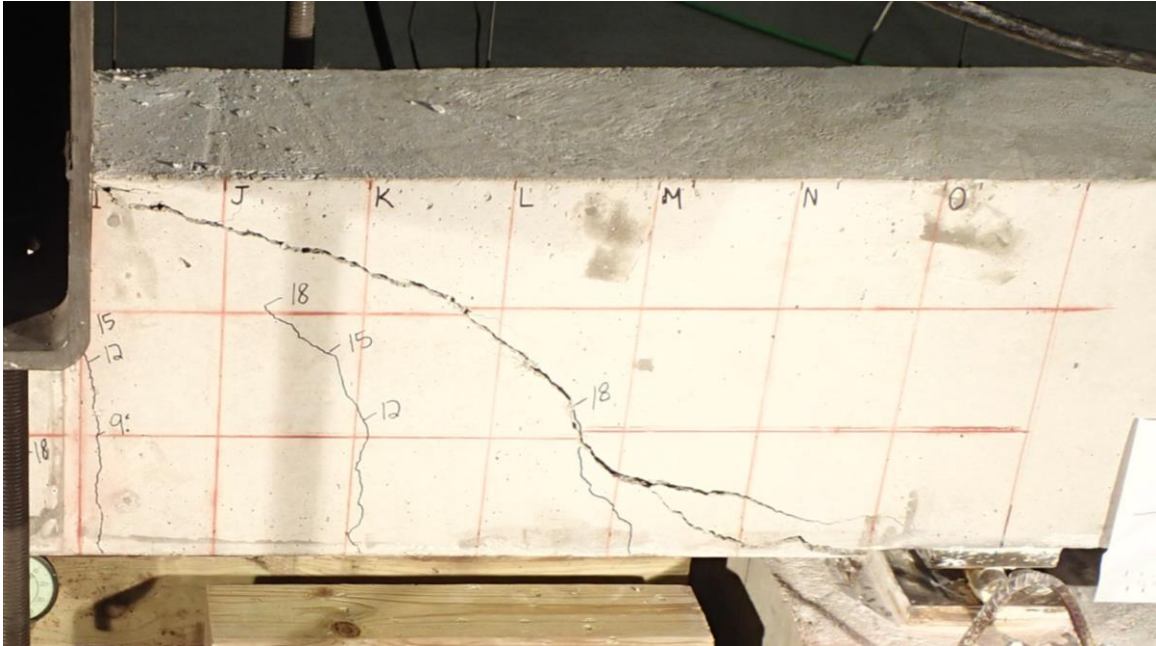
Specimen I-1: South Side Failure Inclined Crack
